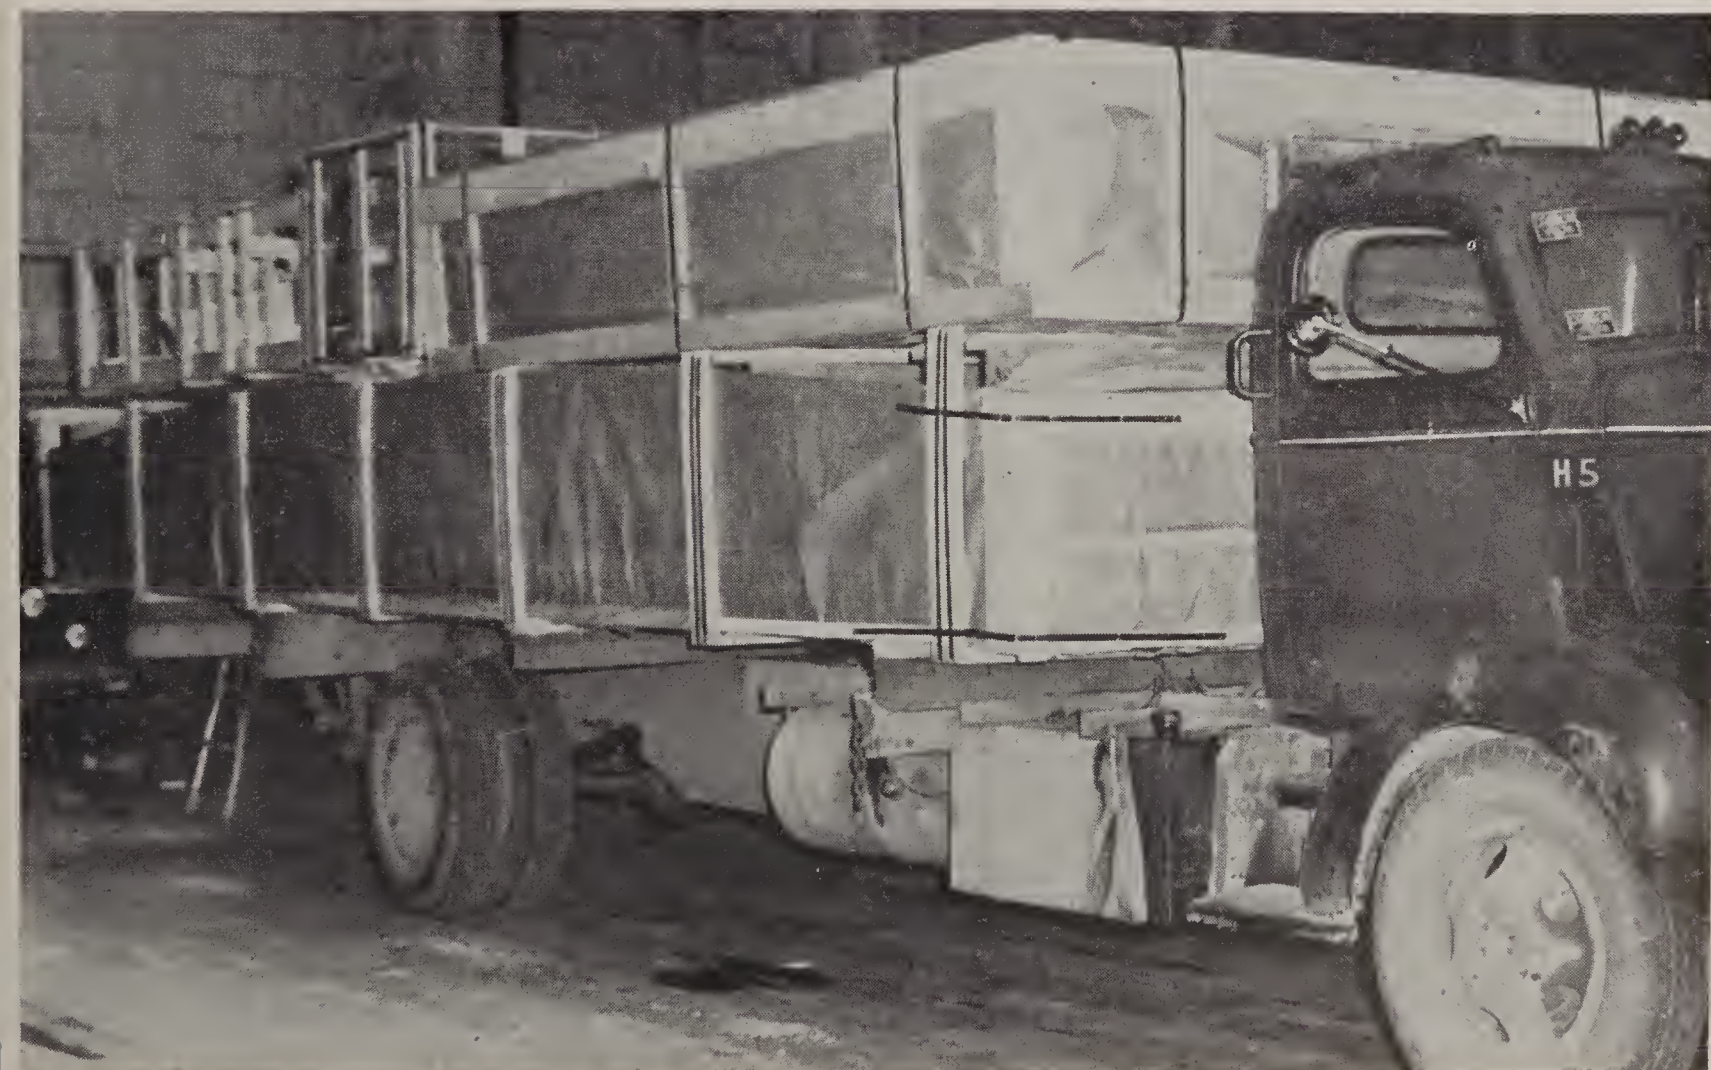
Sections of prefabricated house crated for open truck shipment.
